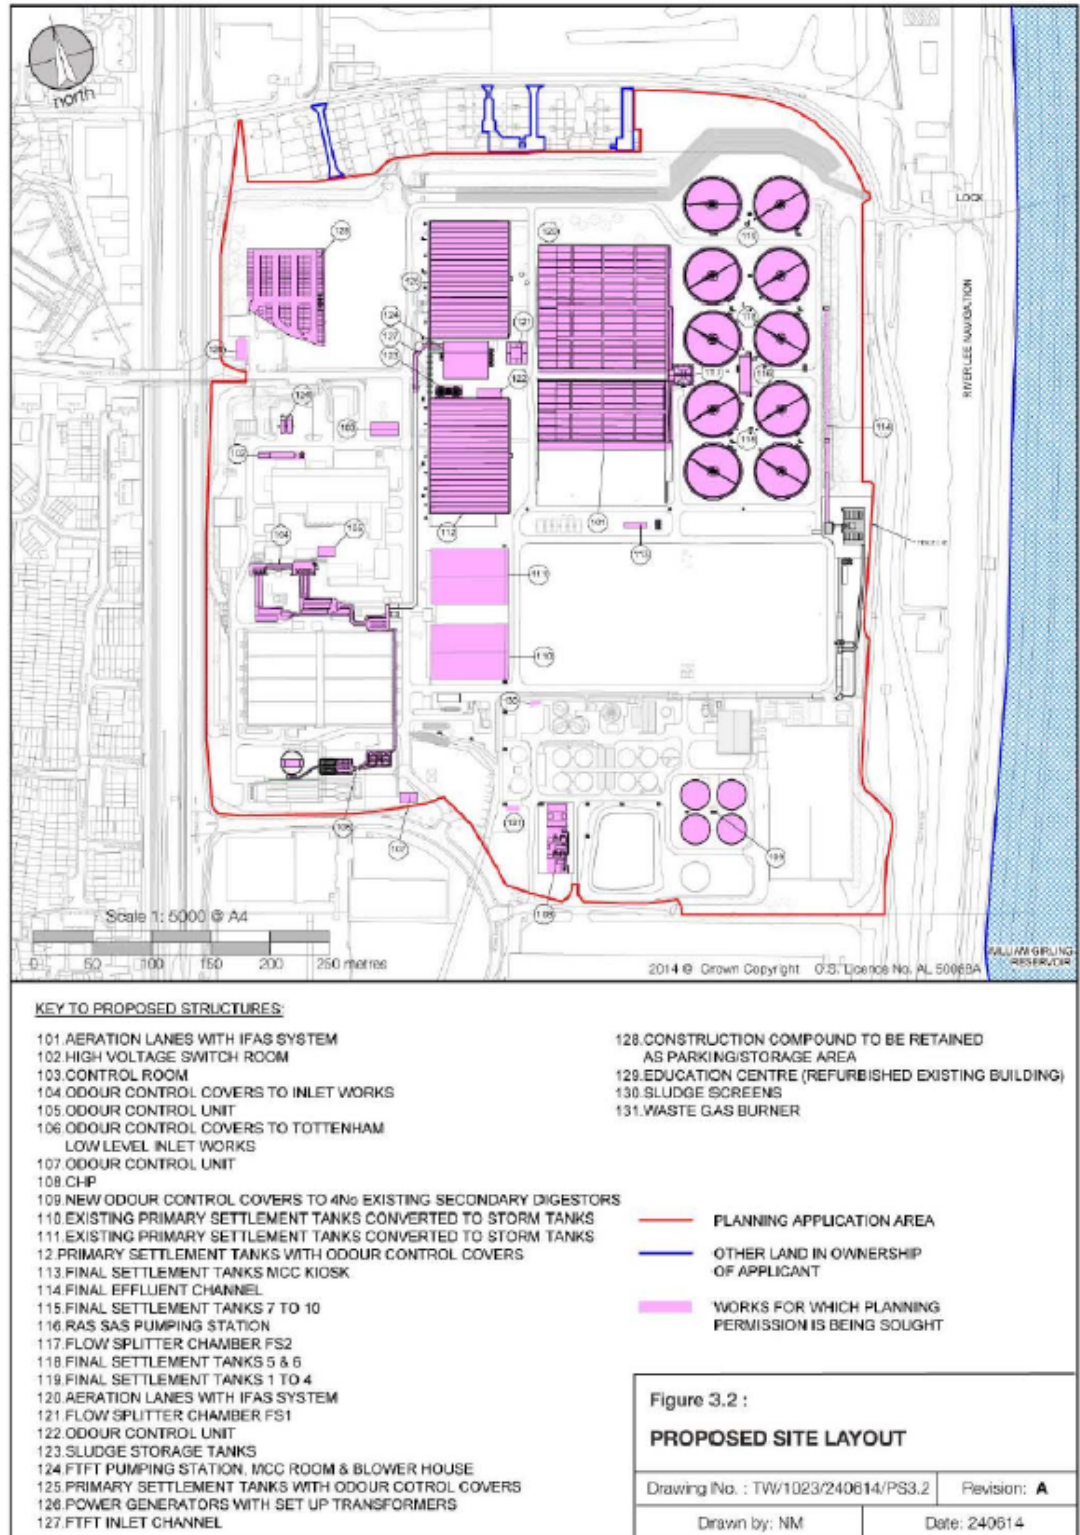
Application 14/02612/FUL - Planning Statement – Proposed Site Layout
